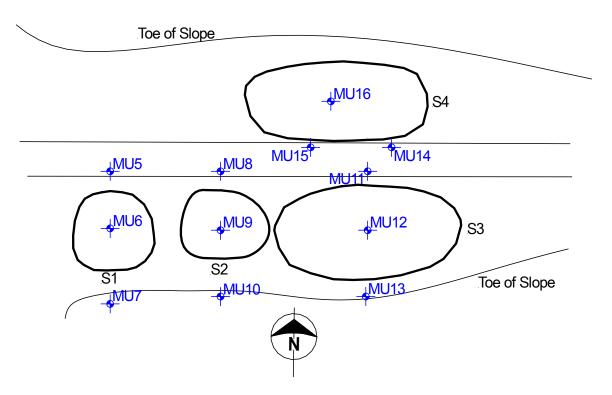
Plan view of I70-Emma site showing approximate boring locations.
